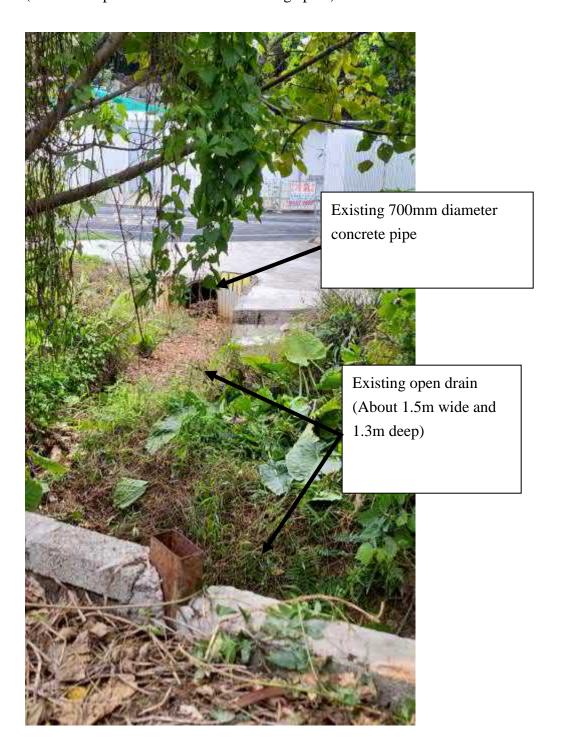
Existing open drain and connection to a 700mm diameter concrete pipe (Photo viewpoint is shown on the drainage plan)
